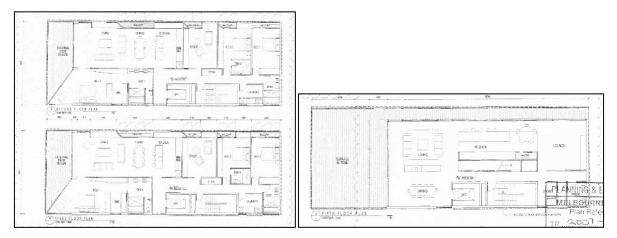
extracts of the endorsed floor plans for TP-2007-706 at 16 Agnes Street (Source: Council records)
